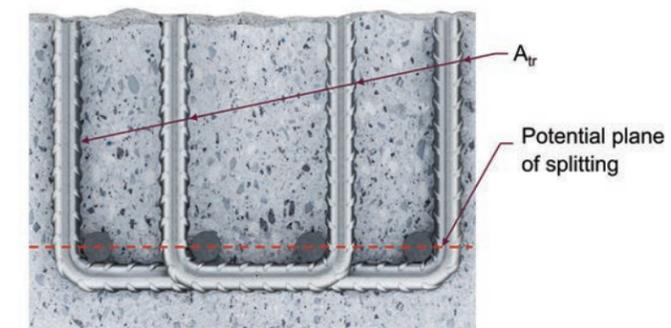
Potential plane of splitting due to closely spaced reinforcing bars.
